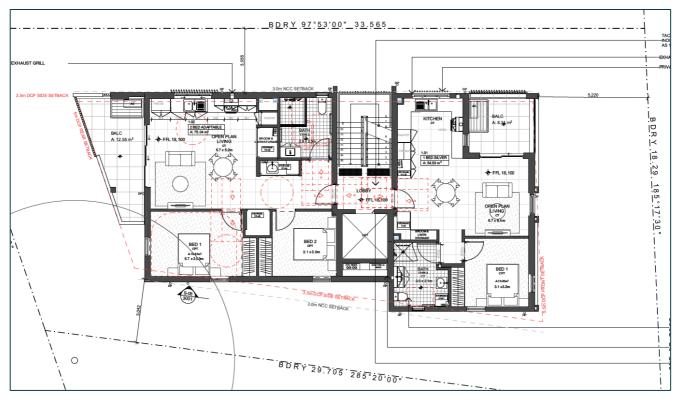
Extract from Architectural Plans - First Floor Plan (Source: Integrated Design Group, dated 13.12.2024)
